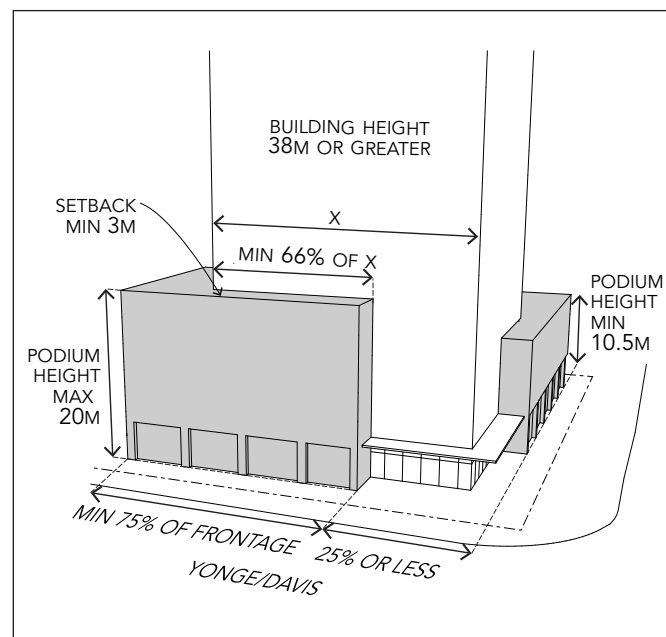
Podium Street Frontage, Minimum and Maximum Height and Setback for Buildings 38 metres or more.
